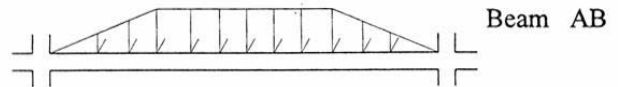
Trapezoidal distributed load for Beam AB of Fig. 2-16.
